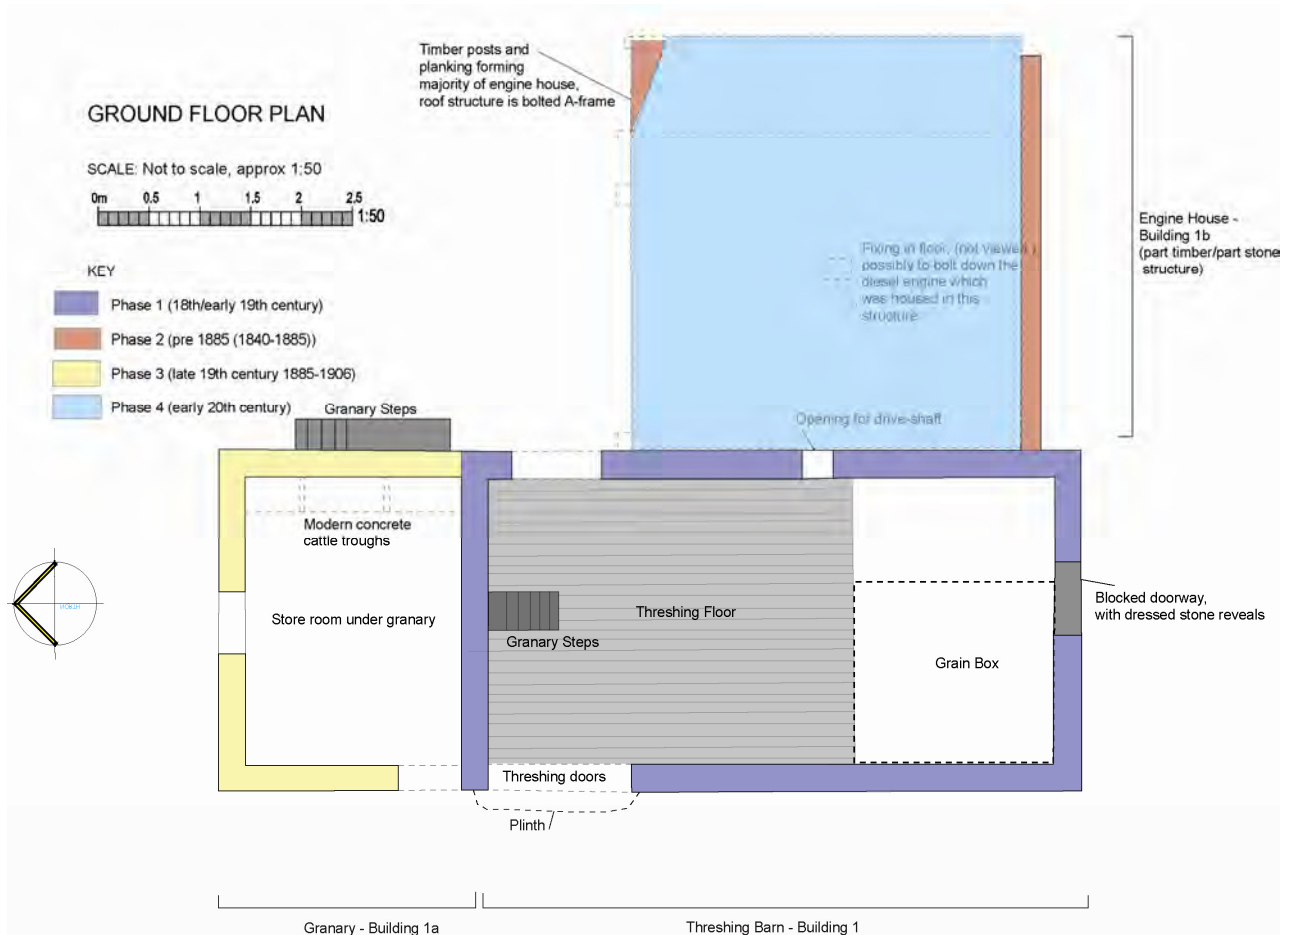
Phased plan of the ground-floor of the threshing barn (B1) and additions (B1a & B1b).
